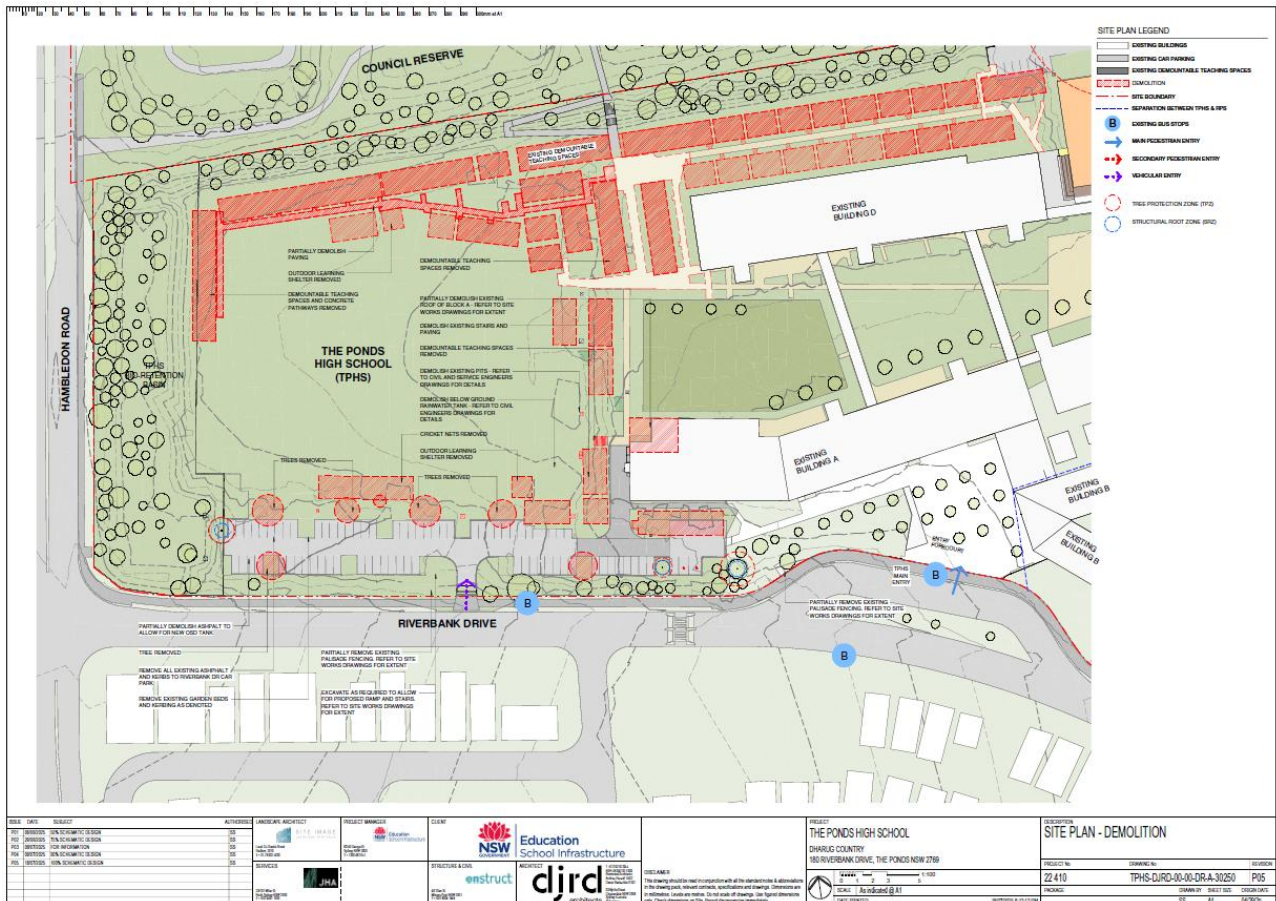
Indicative Demolition Plan. (Source: DJRD Architects)
